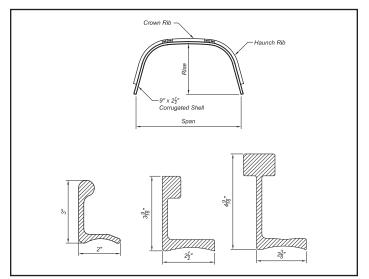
Examples of aluminum Type II, IV and VI rib transverse stiffeners
